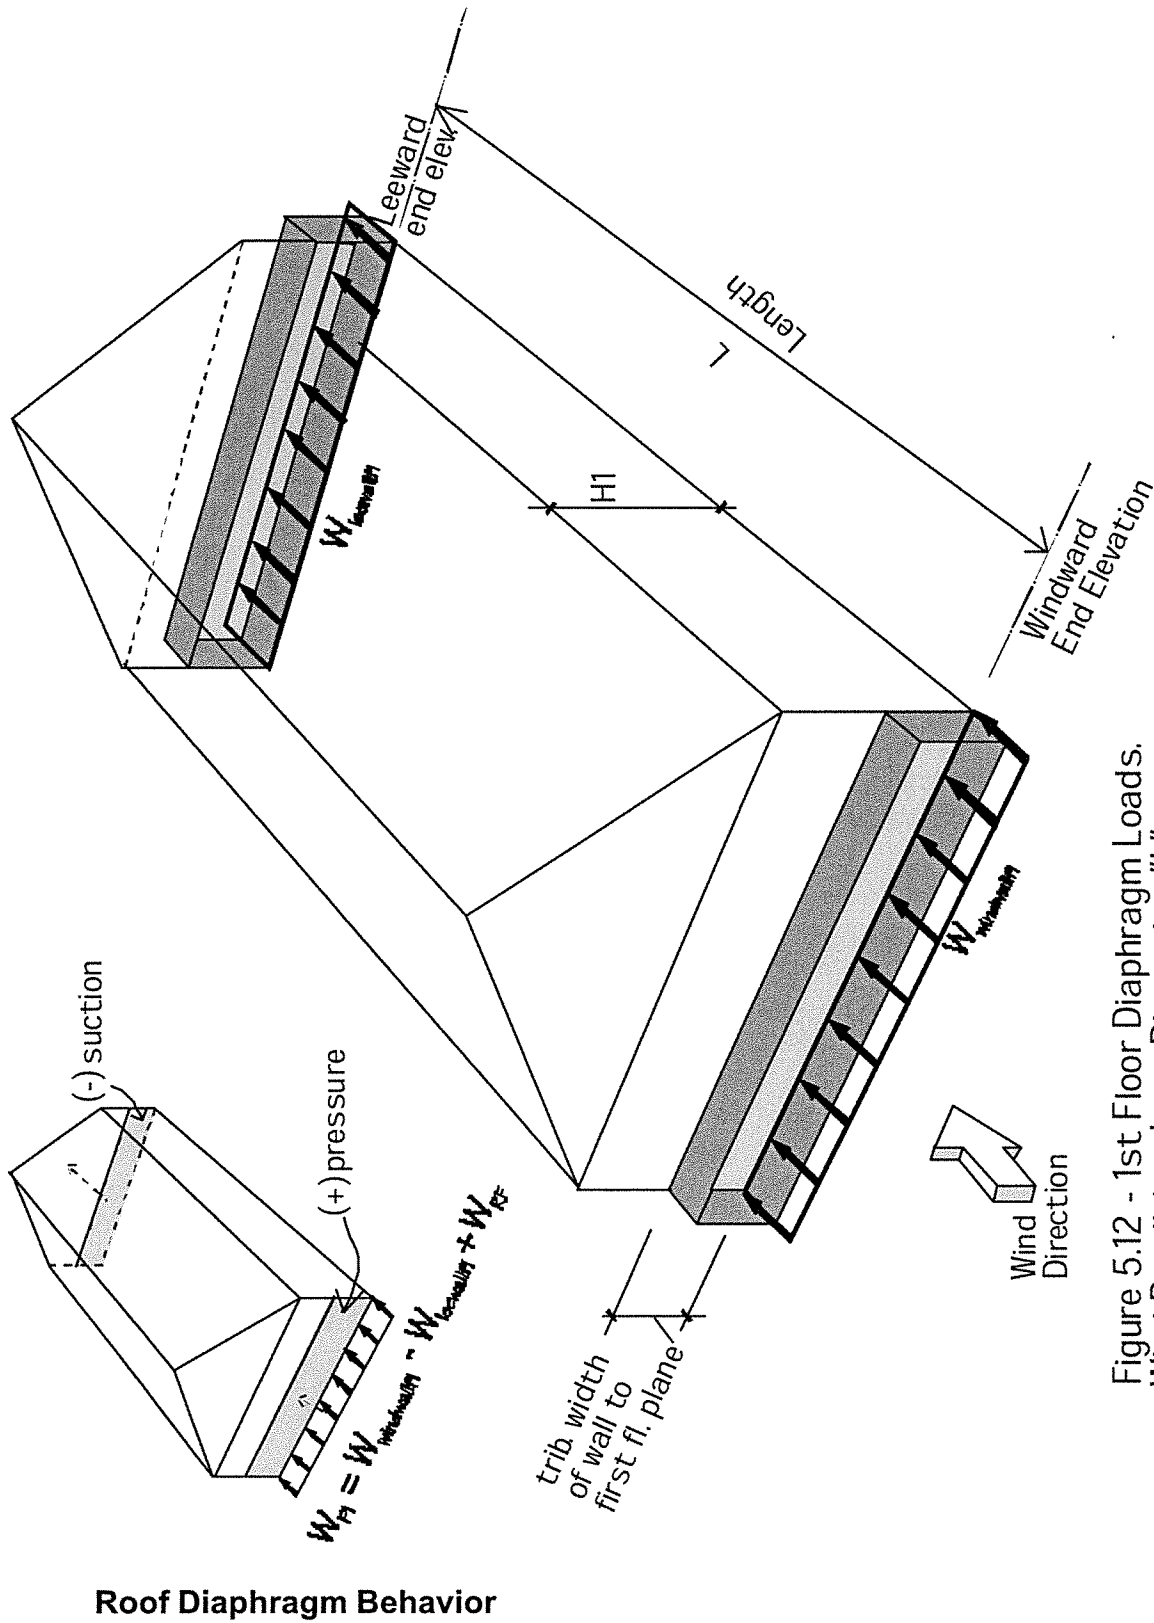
1st Floor Diaphragm Loads. Wind Parallel to Long Dimension "L", One Story.
